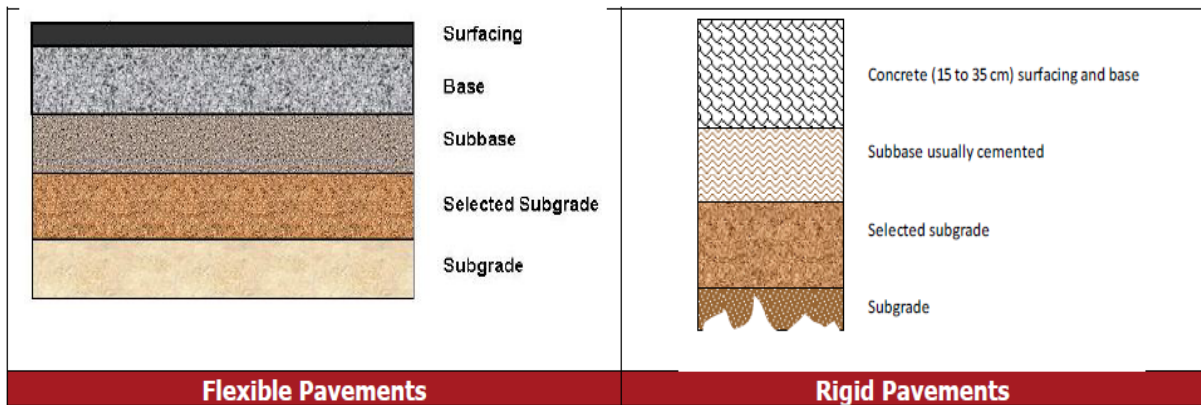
Typical Pavement Structures (SA P E Manual, 2013)
